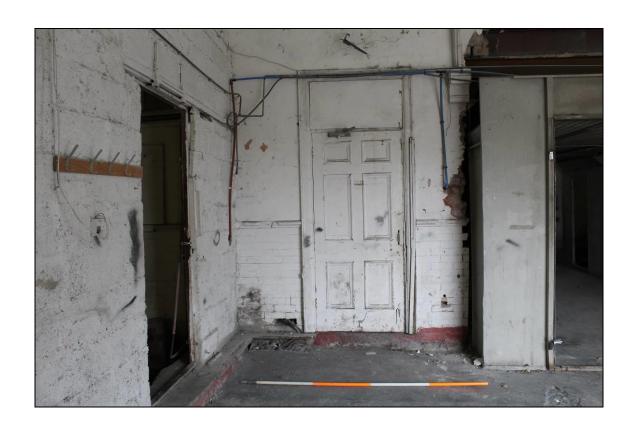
Room 3a & Room 4a: view north, scale: 2m
